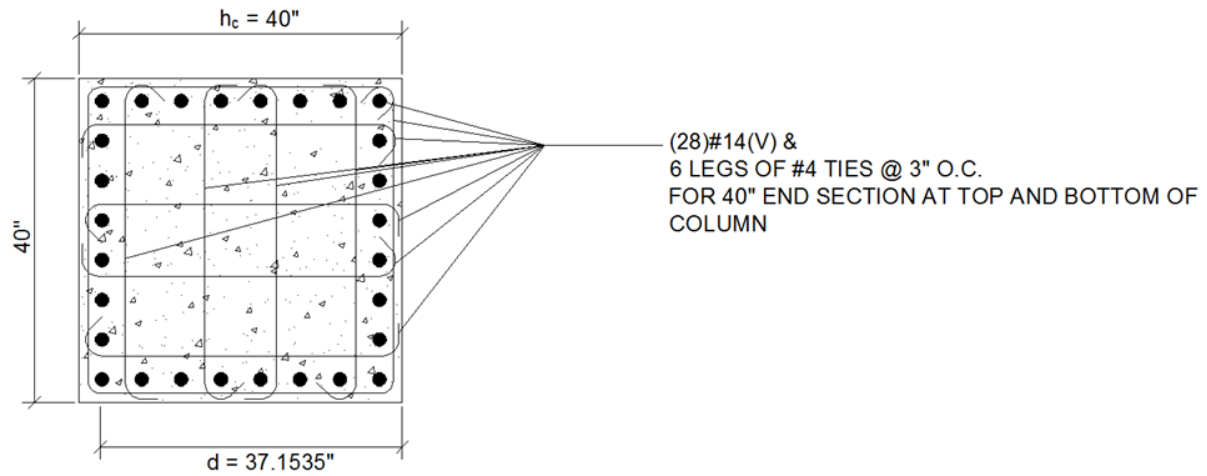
Exterior corner column, cross-section at end section of column at ground floor level based on tsunami design requirements.
